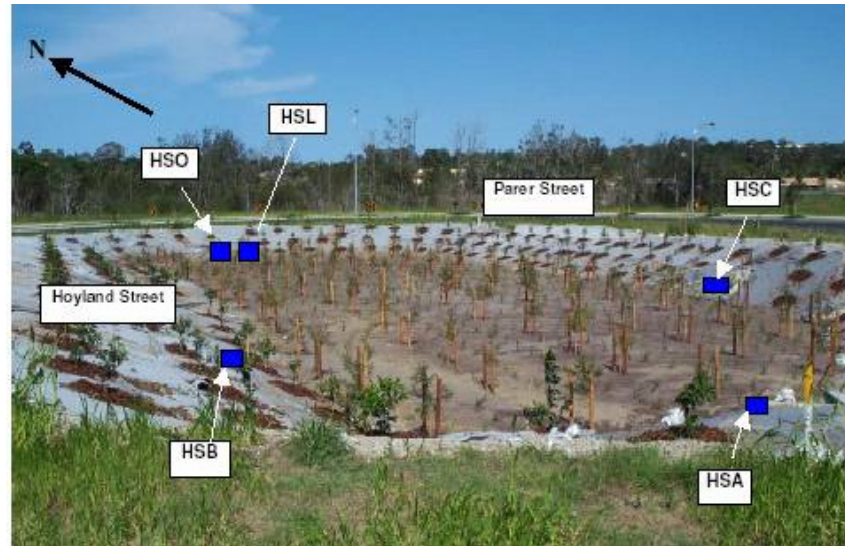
Hoyland Street following construction in January 2002 (BCC, 2006)
